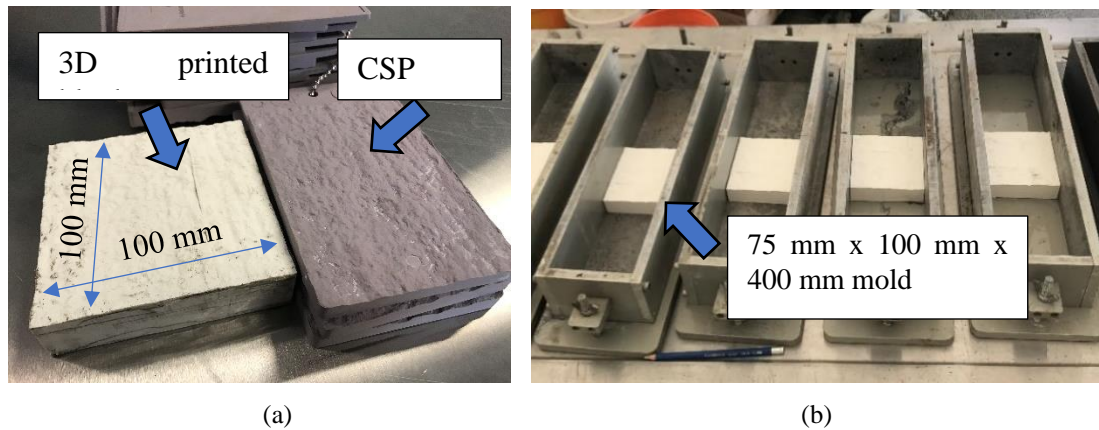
Mold preparations (a) 3D printed block and #6 CSP chip (b) 3D printed blocks in molds
